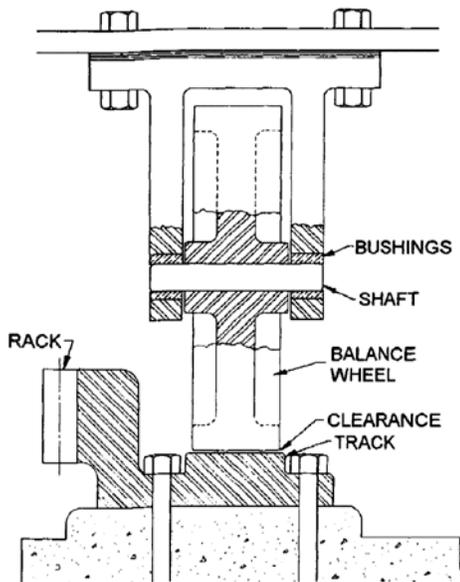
A balance wheel assembly where the rack teeth have been machined into the curved track
